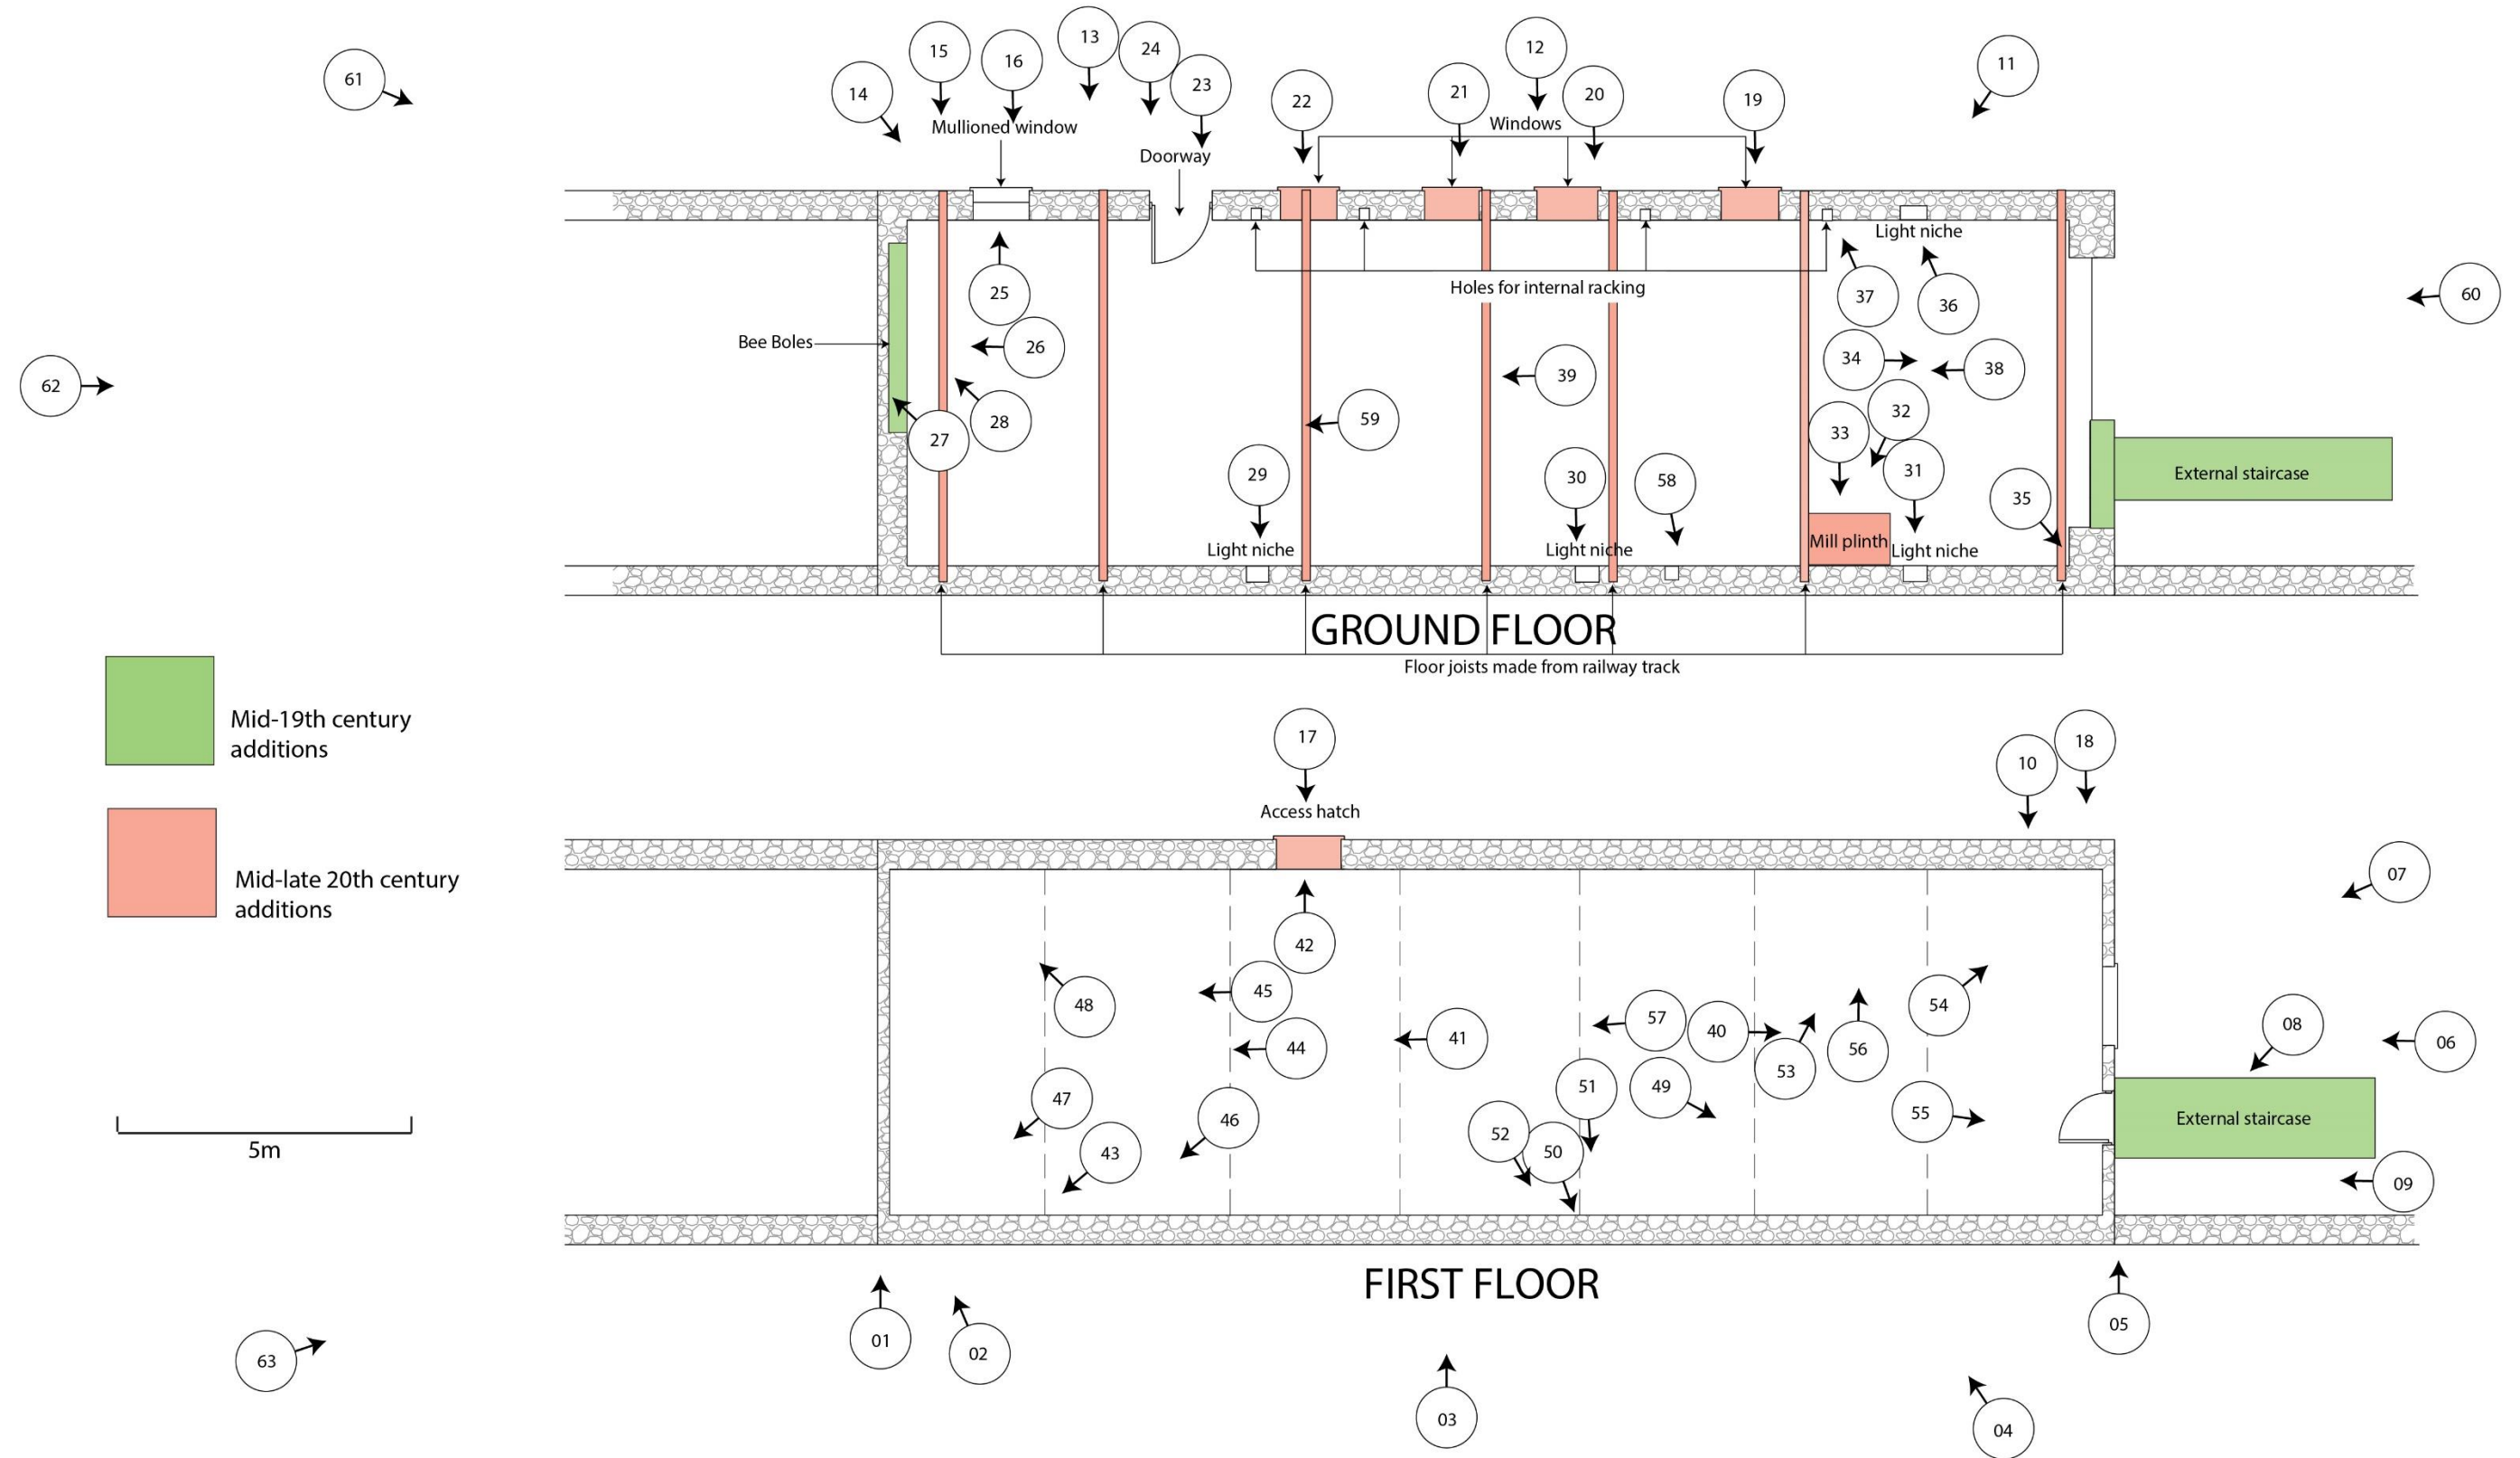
Plan showing photo locations (circled) and additions to the original fabric (reproduced courtesy of McCartneys Planning and Survey)
